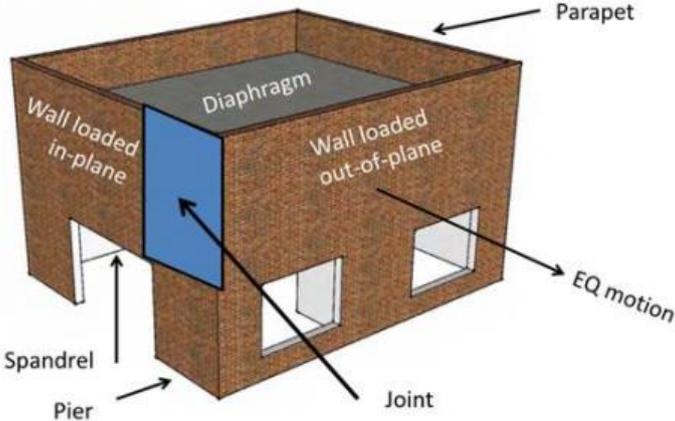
Building schematic displaying in-plane and out-of-plane loading.
